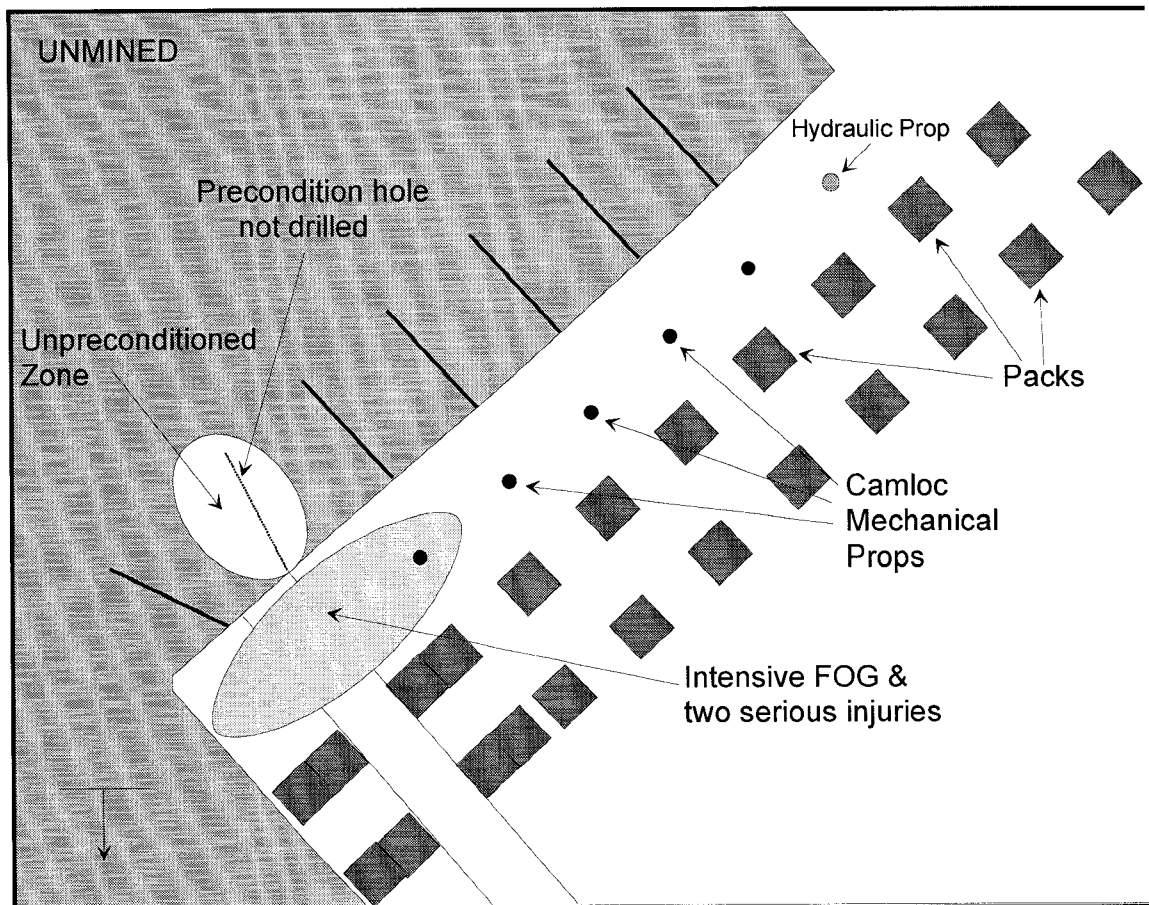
Schematic plan of West 2 (Diagonal) panel (Not to scale).
